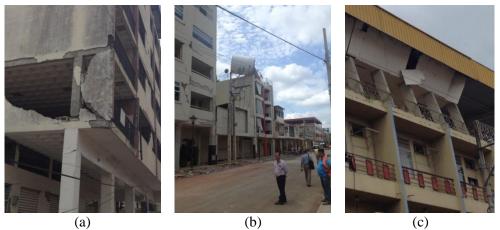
Examples of buildings with high risk of unstable elements falling on the street
